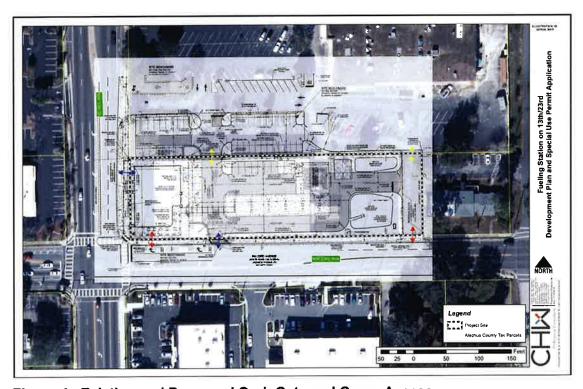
Existing and Proposed Curb Cuts and Cross Access
